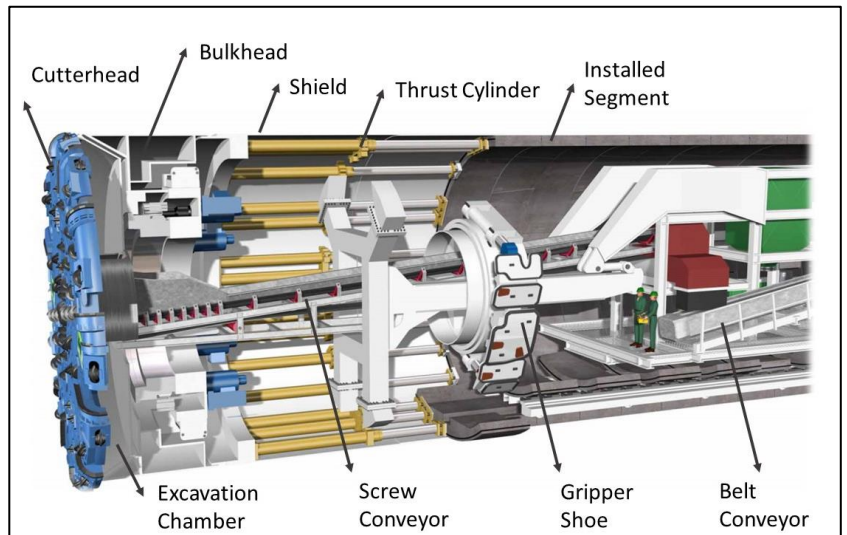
Boring Machine Diagram (Tunnel boring machine (TBM) (n.d.)).
